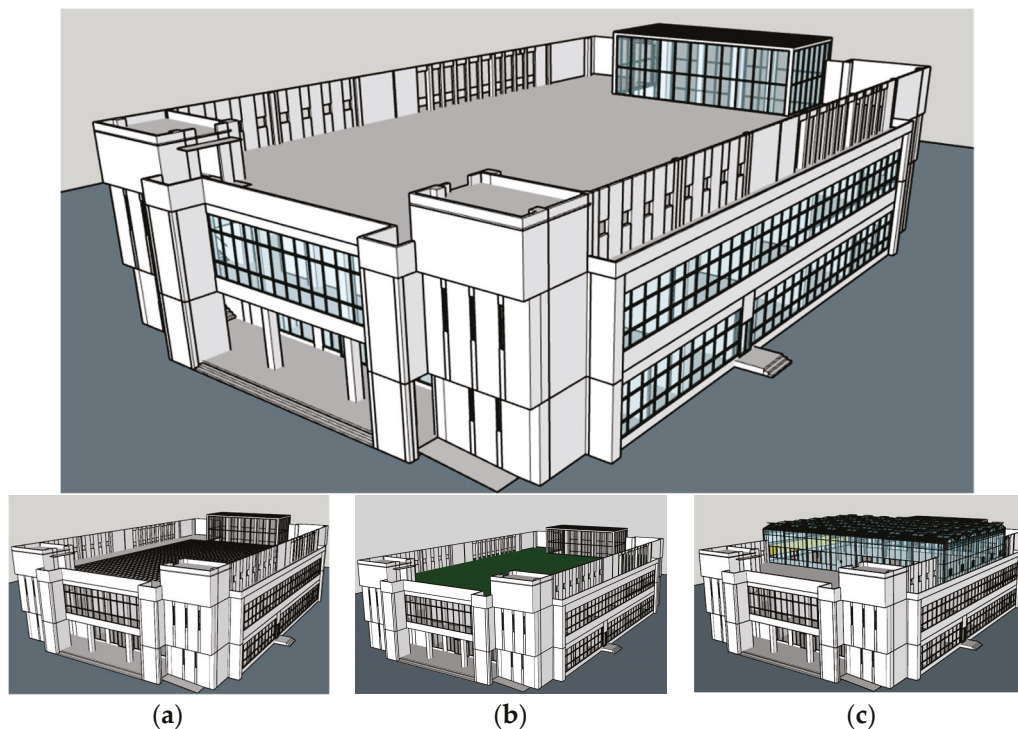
Lecture hall building model. (a) Photovoltaic roofs; (b) green roofs; (c) greenhouses roofs.
